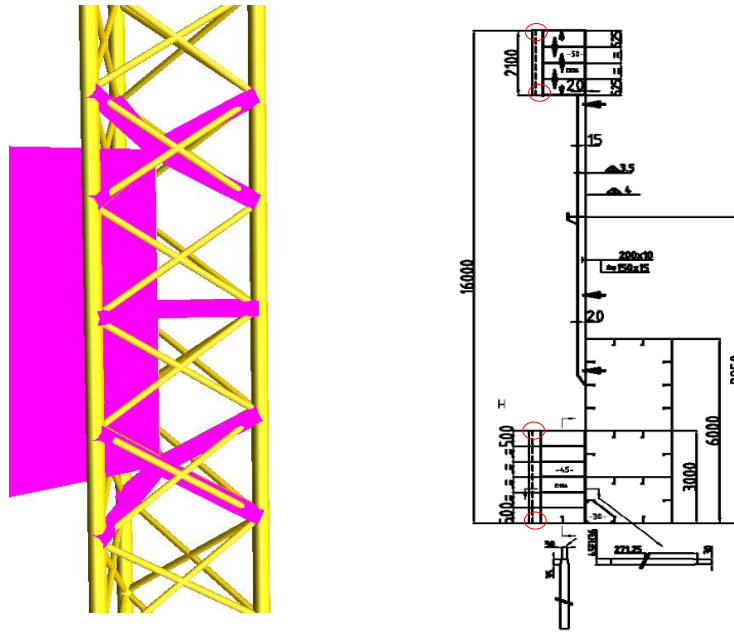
Highlighted modelled connecting rigid beam (left). Cross section of the jack house with connecting points circled in red (right)
